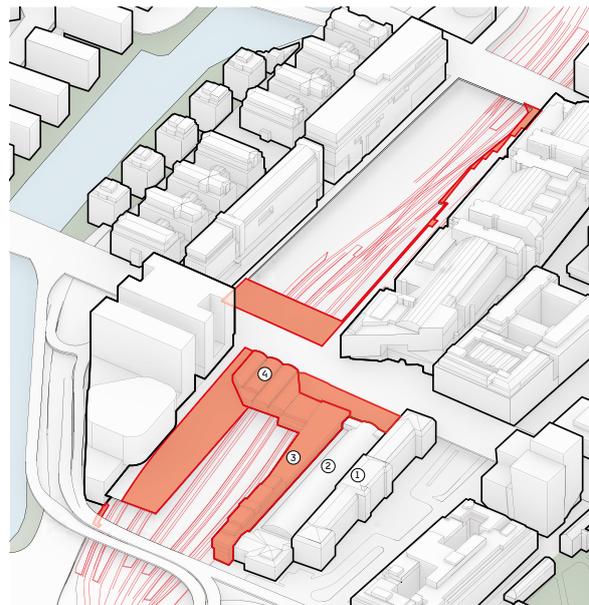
Red structures will be demolished or changed considerably due to the development 1.A- house 2.B- house -Central Hall 3.C- house 4.Upper entrance hall.
